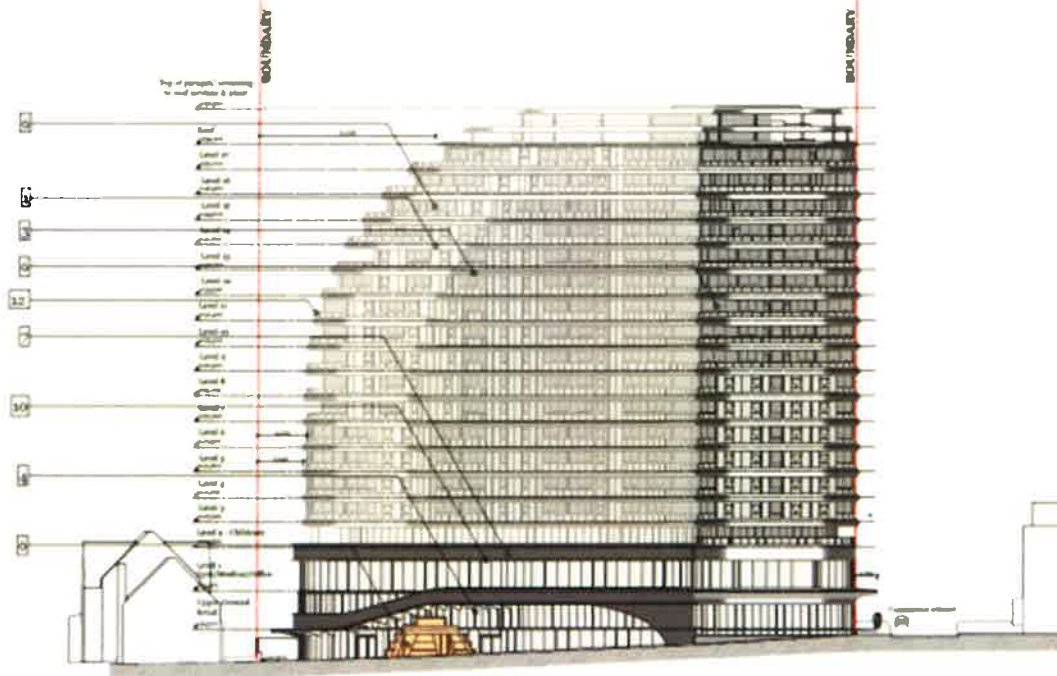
Station Street elevation of proposal showing height of podium relative to the church.
